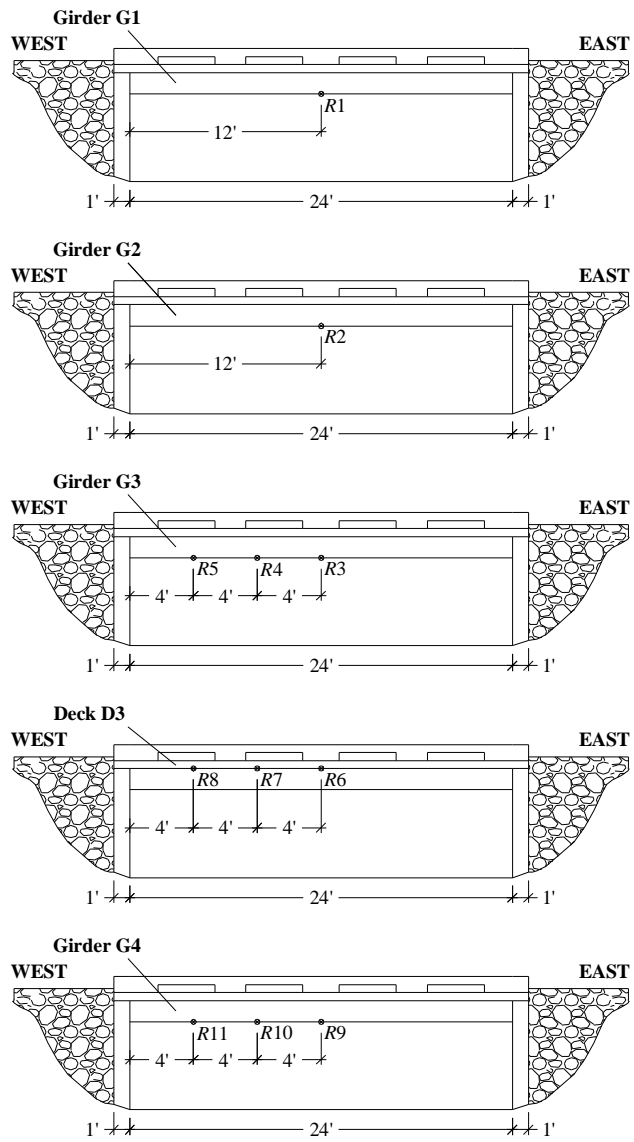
LVDT Positions in the Load Test Prior to Strengthening
